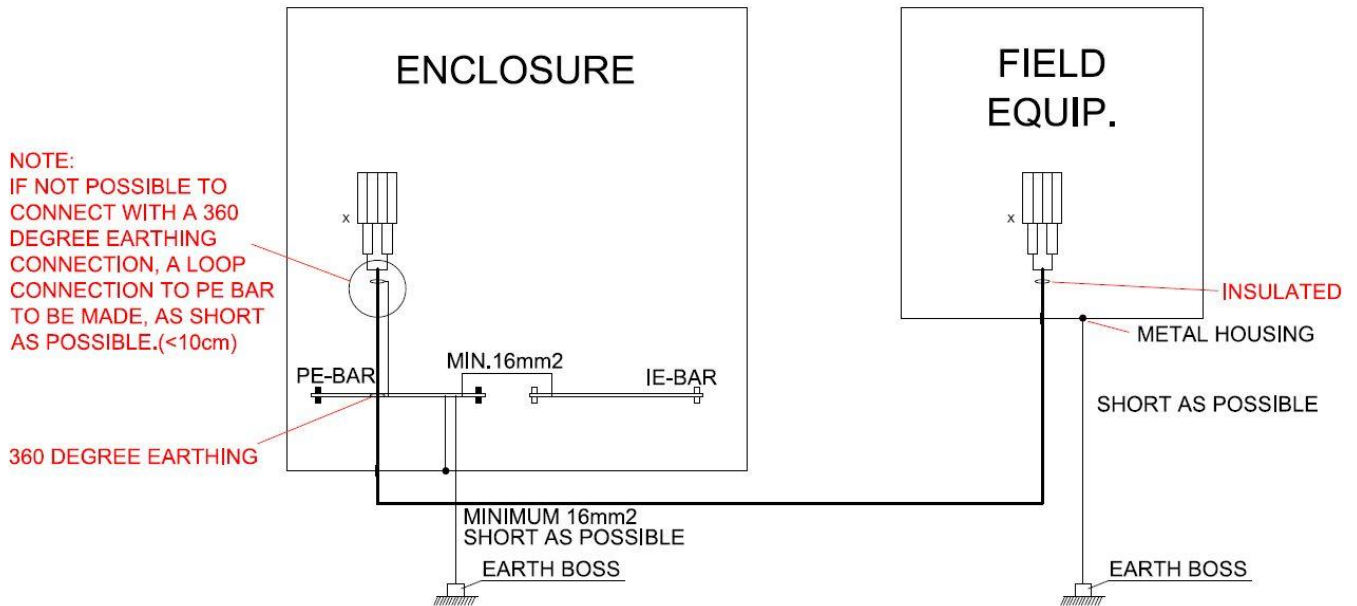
Instrument cable with overall shield/braiding connection non-EMC entry.
